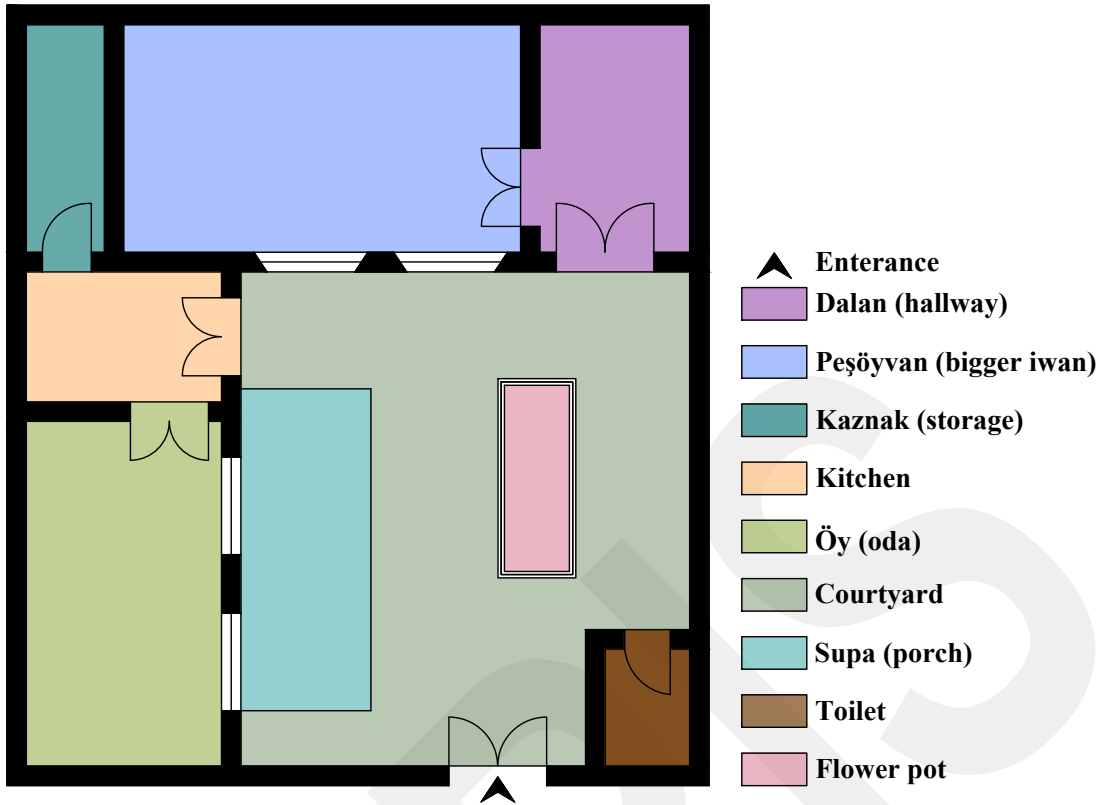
Plan of a court-centered house in Kashgar Old City (source: Aibi, 2016)
